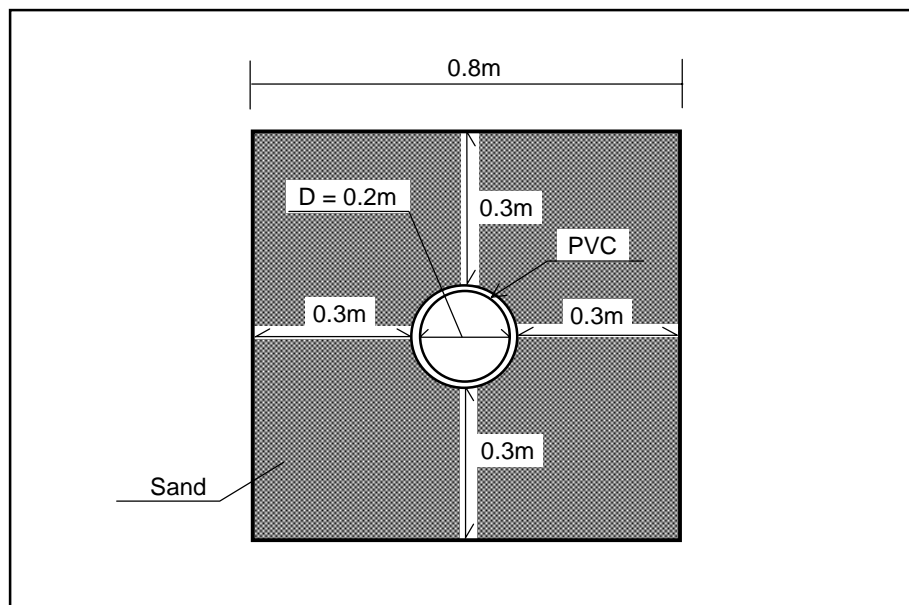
Typical Section of Leachate Pipe in Sofulu
